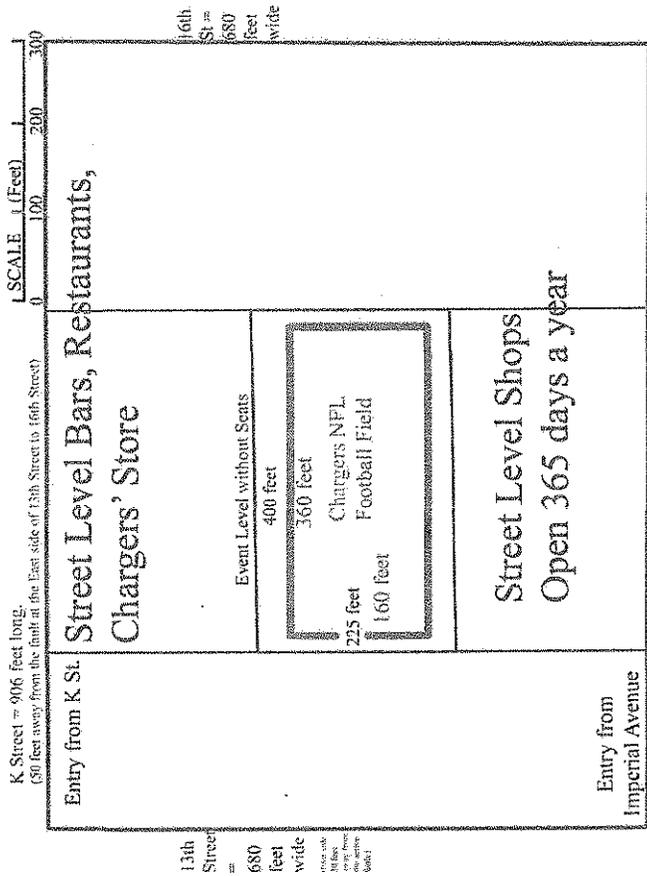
Potential Floor Plan for the Street Level of the Multi-Purpose Chargers Stadium and Event Center.
